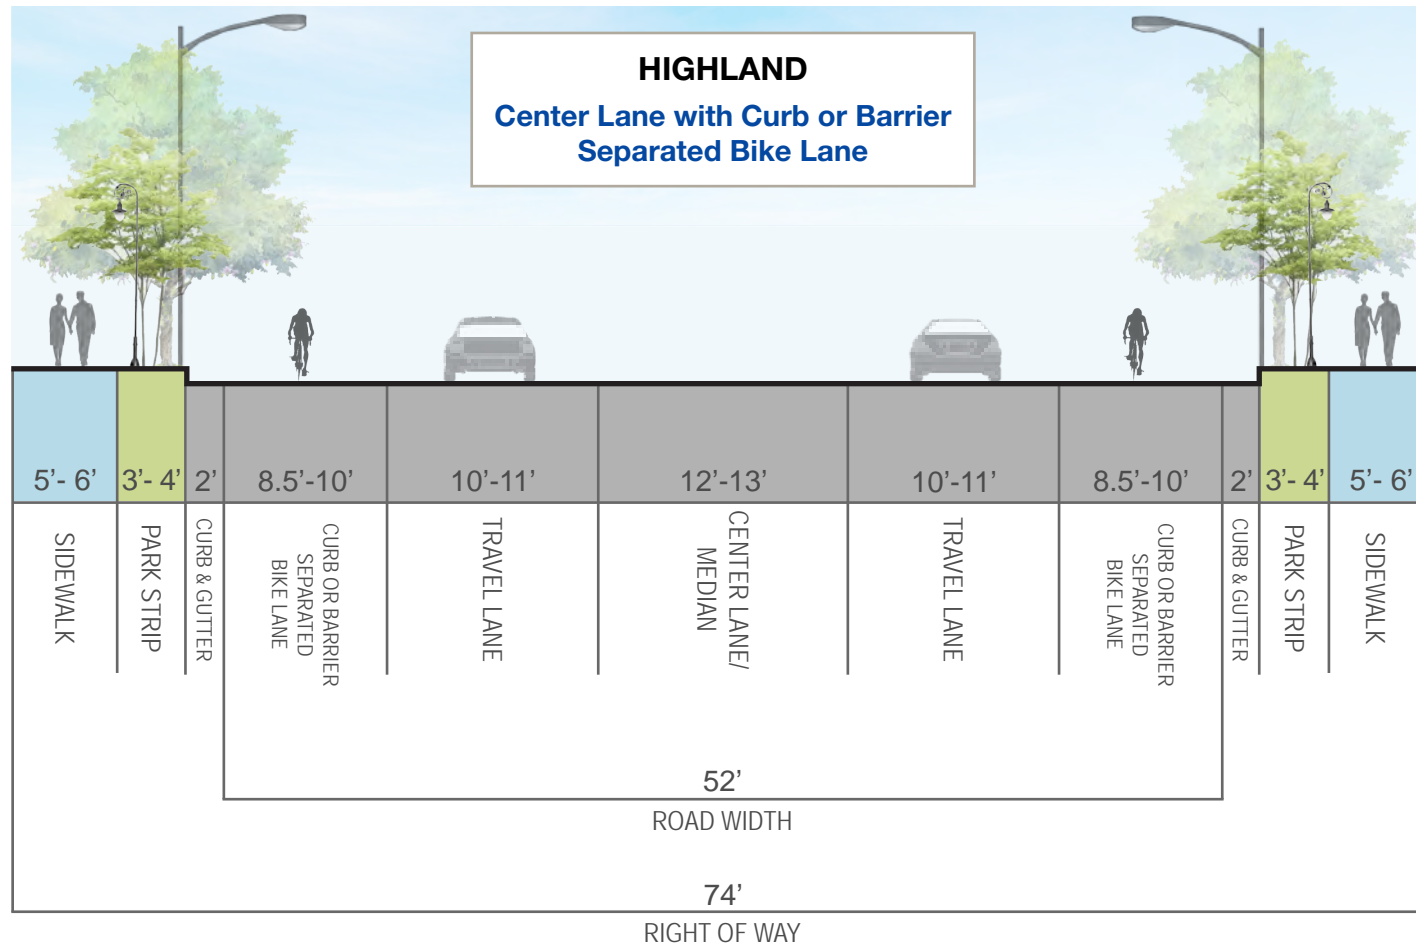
Center Lane with Curb or Barrier Separated Bike Lane
